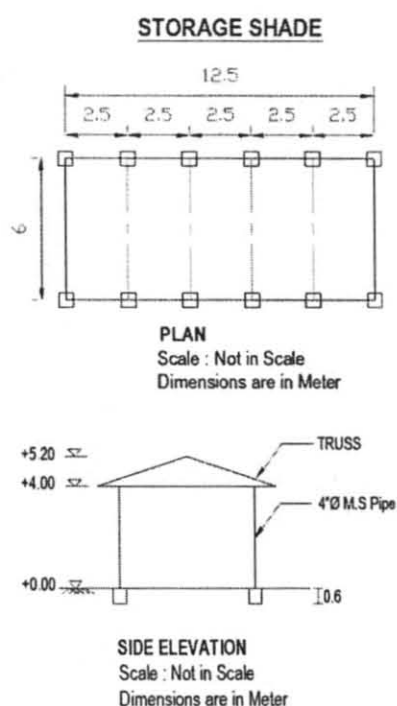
Materials Recovery Facility (Storage Shade: plan and side elevation)
